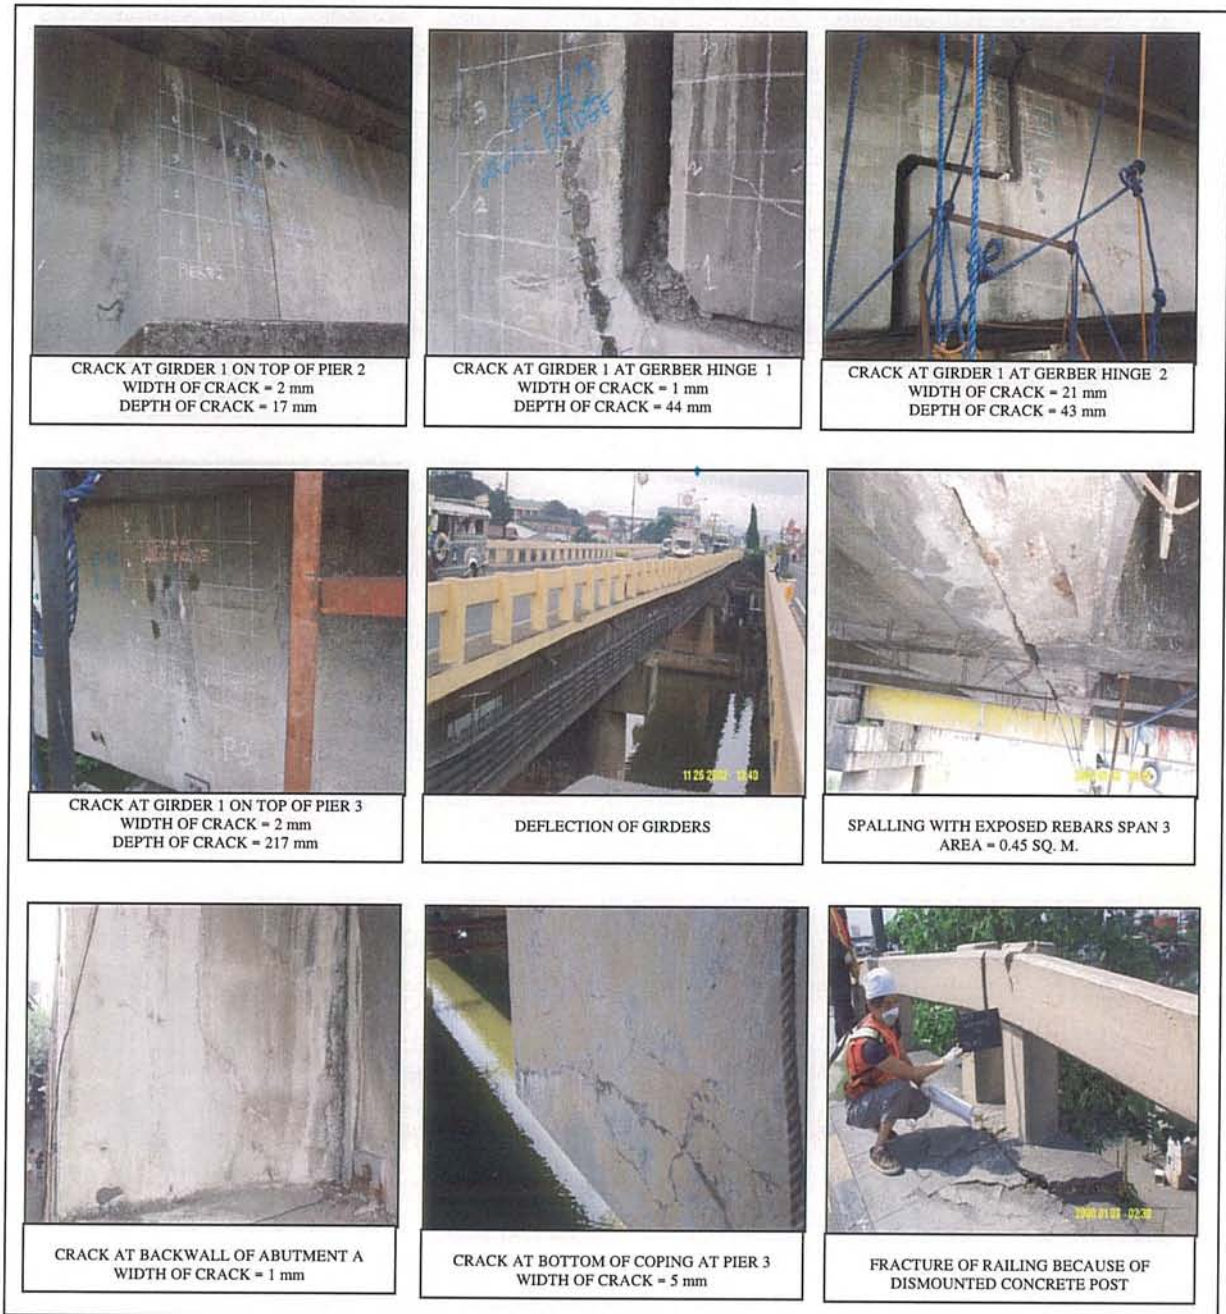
Close-Up Visual Inspection of Damages in Vargas Bridge (Upstream)
